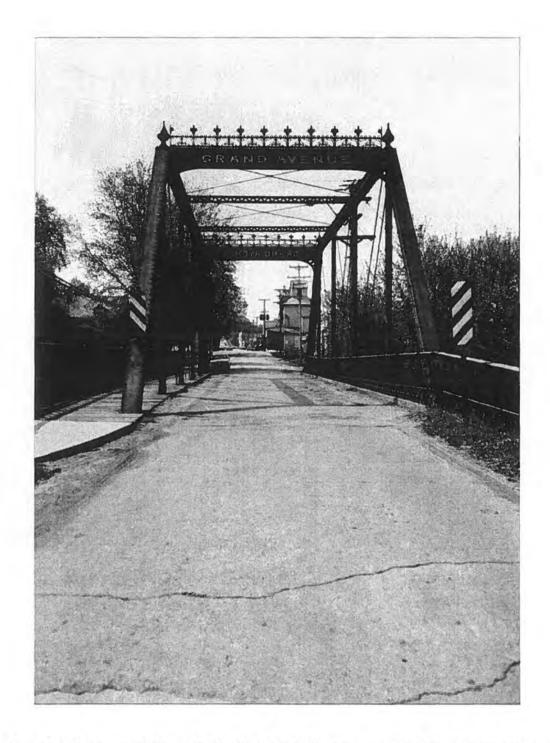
Grand Avenue Bridge, Neillsville, Clark County; overhead Pratt truss, erected 1894; replaced 1986. (Source: HAER No. WI-72).
